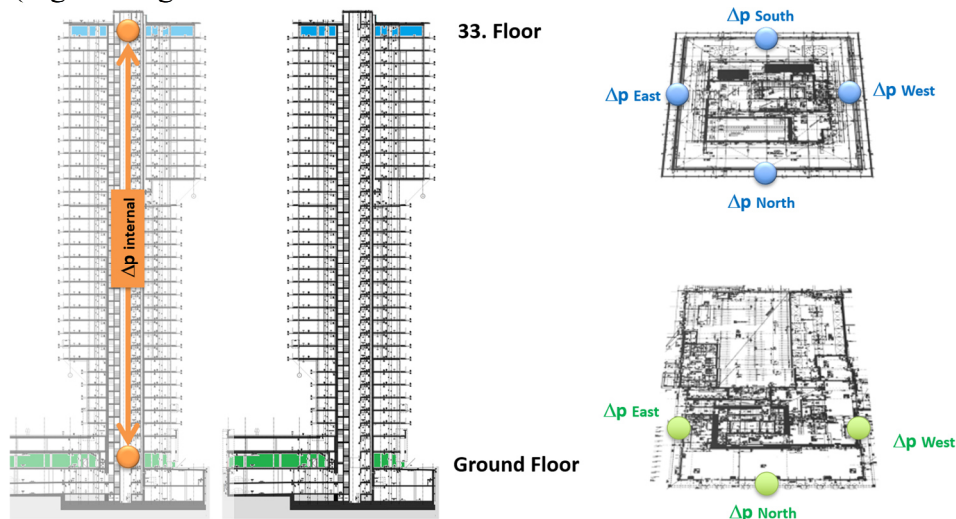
Gauges for interior pressure differential (left) and building envelope pressure differentials (right) in the top standard floor and on the ground floor - illustrated with Tower 1.
